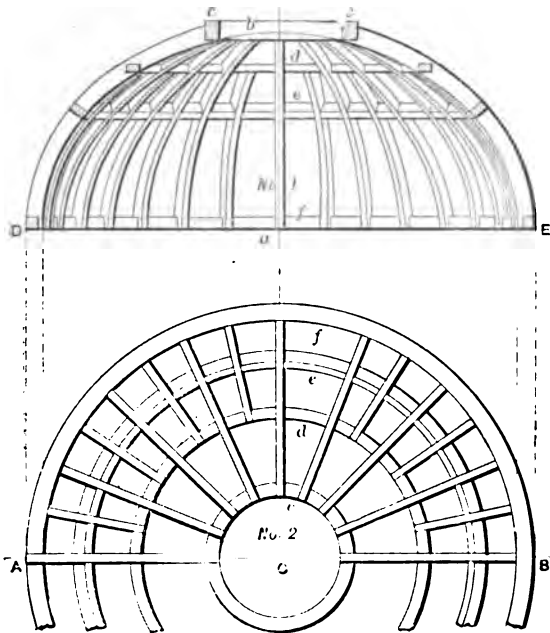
Section and Plan of a Dome Which Is Half of a Prolate Spheroid on a Circular Plan.
